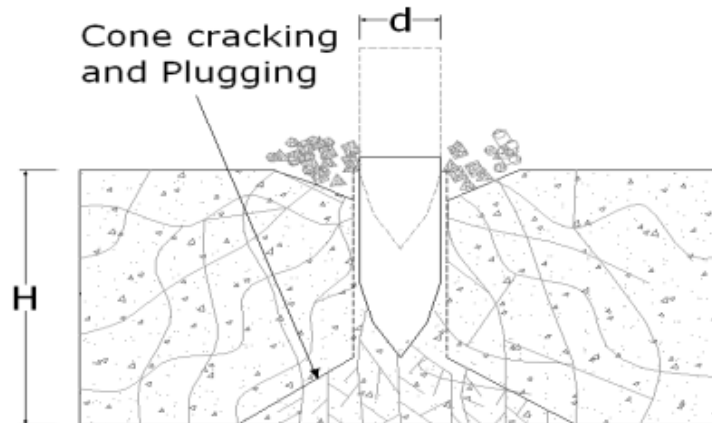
Cone cracking and plugging in local impact phenomena caused by a projectile [39].
